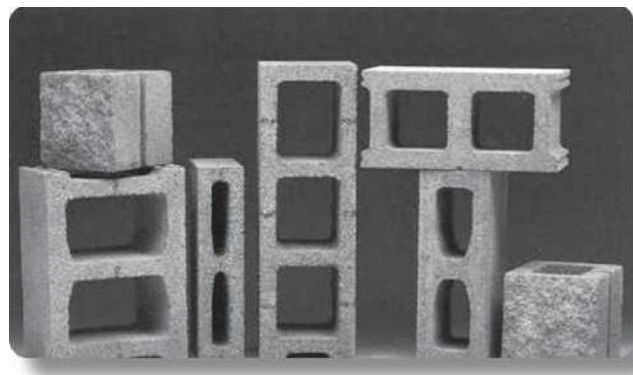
Hollow Concrete Blocks (Source: Building Materials BlogSpot)
